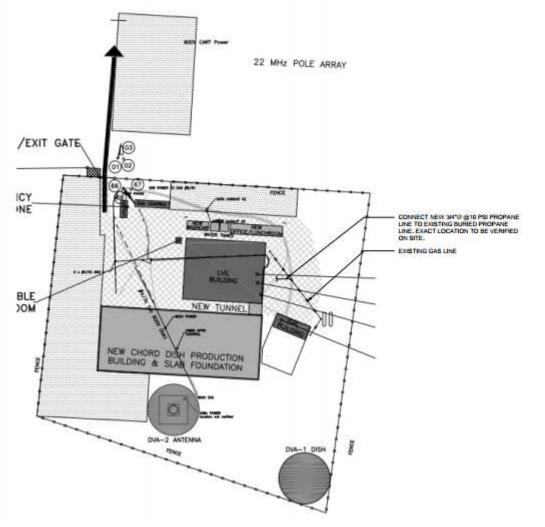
Site Plan at NRC-DRAO CHORD Antenna Production Site
